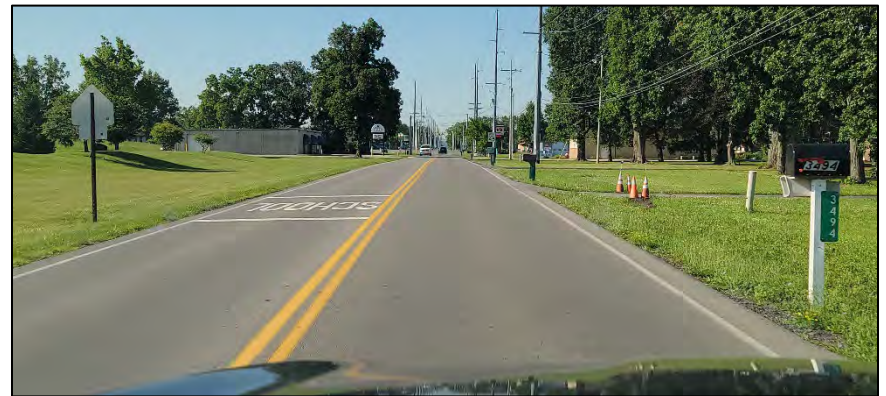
Narrow shoulders along Shawnee Road corridor and no sidewalks
